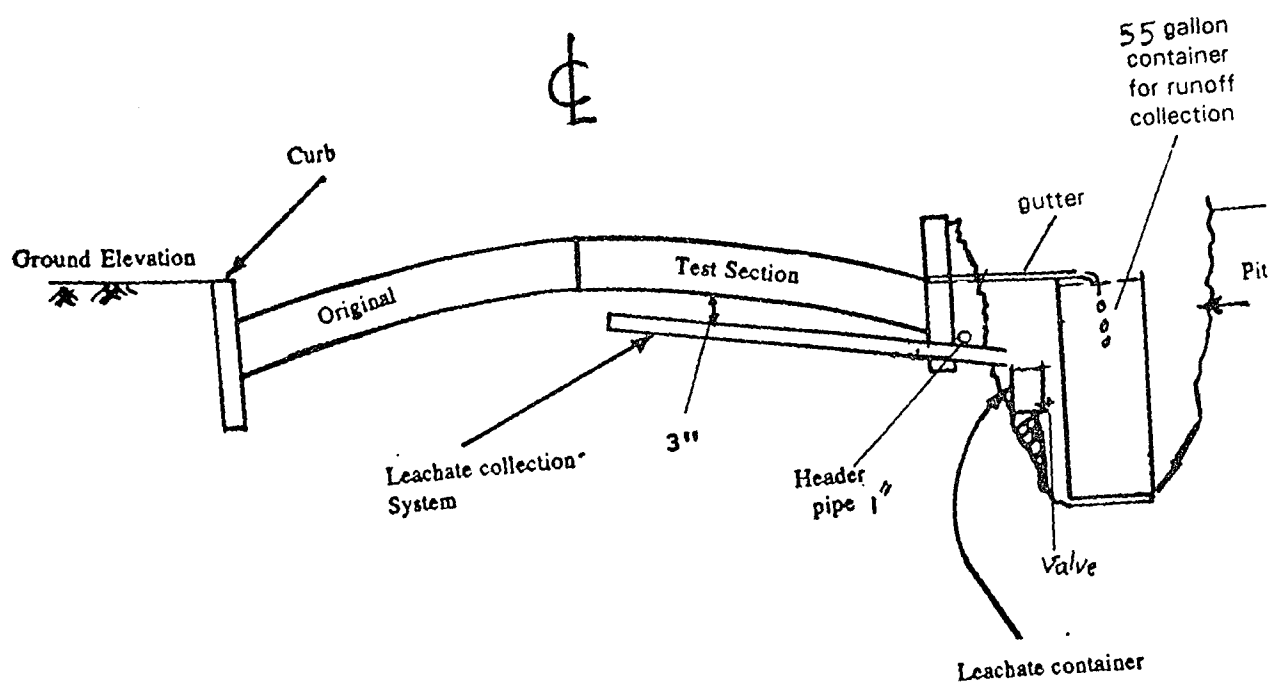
Typical Piping and Leachate Collecting System for Each Road Section
